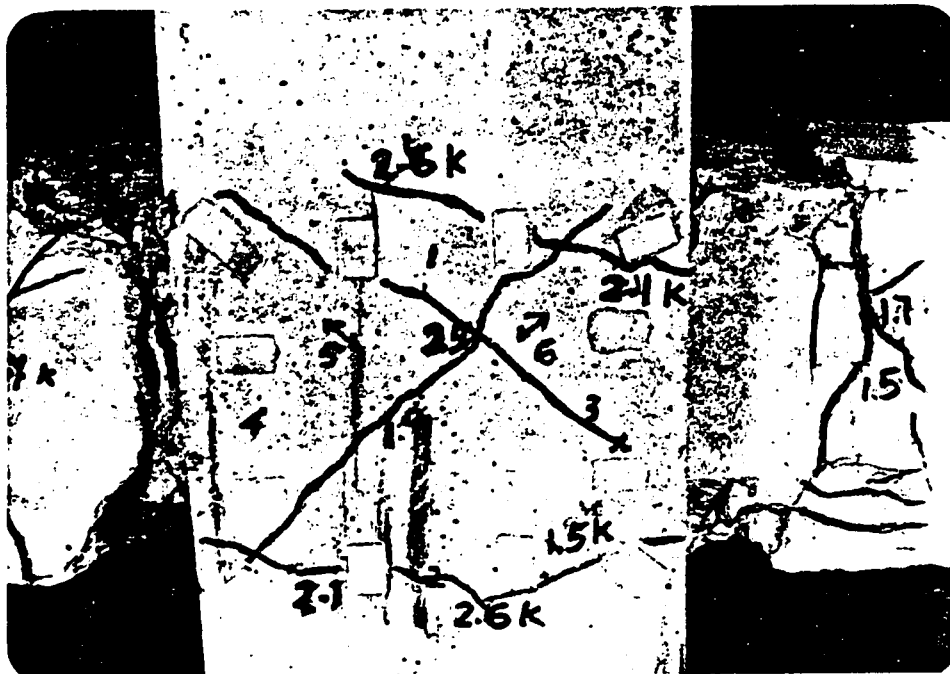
JOINT CONDITION OF SPECIMEN 1 WHEN TEST WAS TERMINATED
